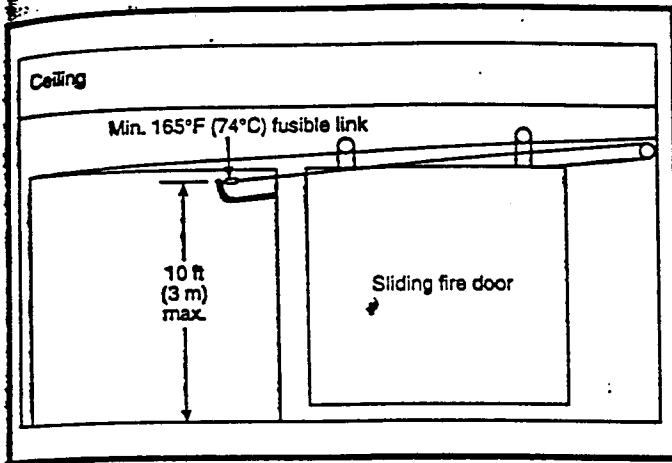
Existing horizontal sliding fire door in accordance with 28-2.2.2.4. By requiring the fusible link to be positioned in immediate proximity to the door opening, rated 165°F (74°C) or higher, and located not more than 10 ft (3 m) above the floor, the door should remain open until rising temperatures make it unsafe to pass through the door opening.
